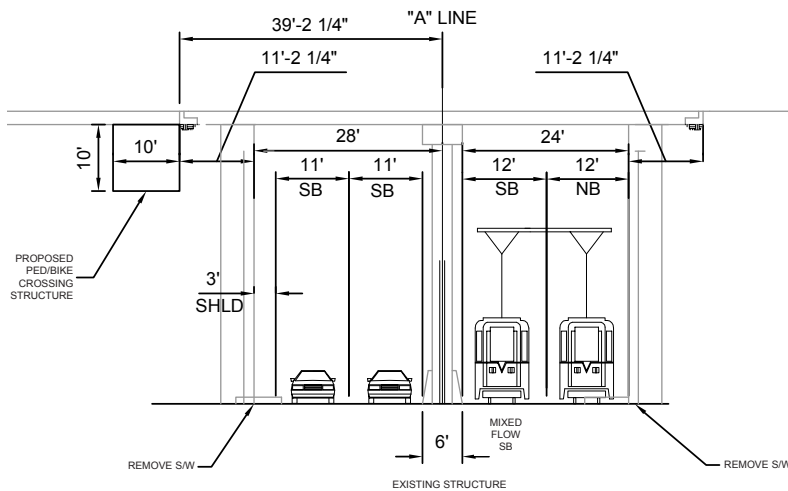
7th Street at UPRR Crossing (looking north)
